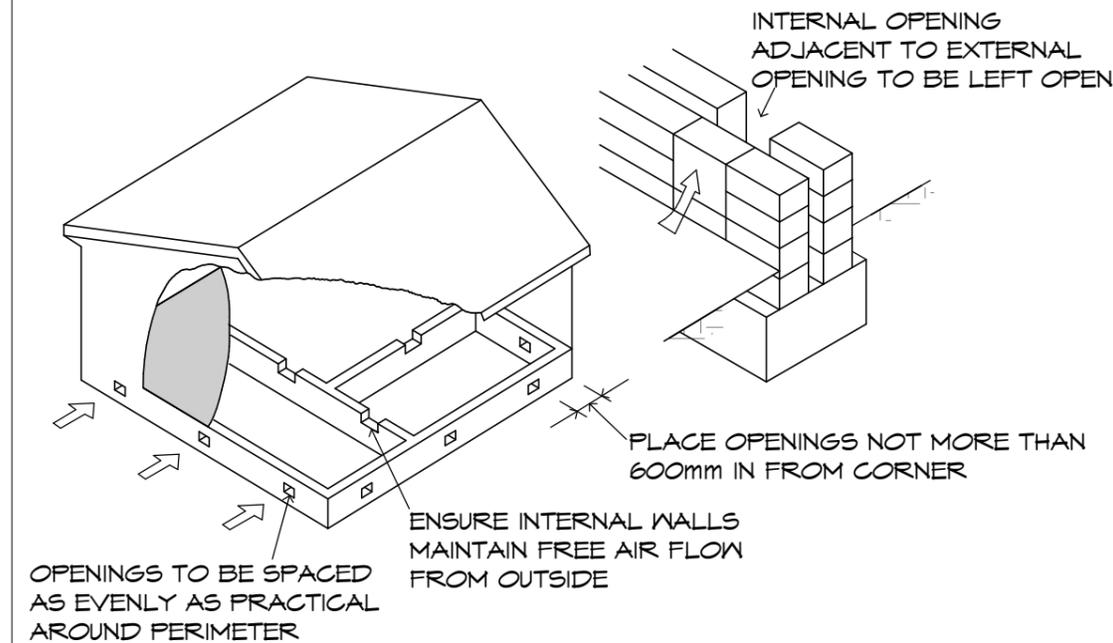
TYPICAL SUB-FLOOR VENTILATION DETAILS - TYPICAL CROSS VENTILATION OF SUBFLOOR AREA
